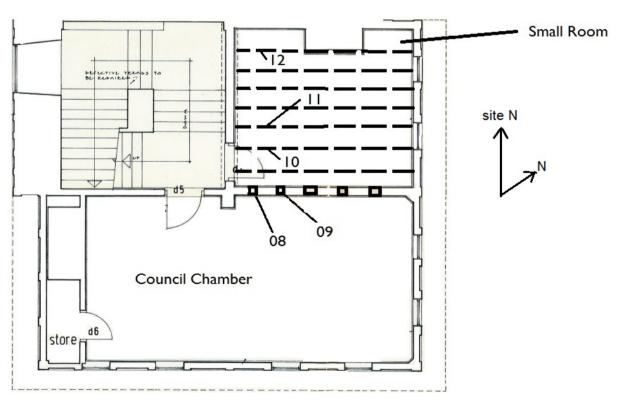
First-floor plan showing the approximate positions of timbers sampled for dendrochronology (adapted from Essex County Council plans drawn by R Crowe, 1974)
